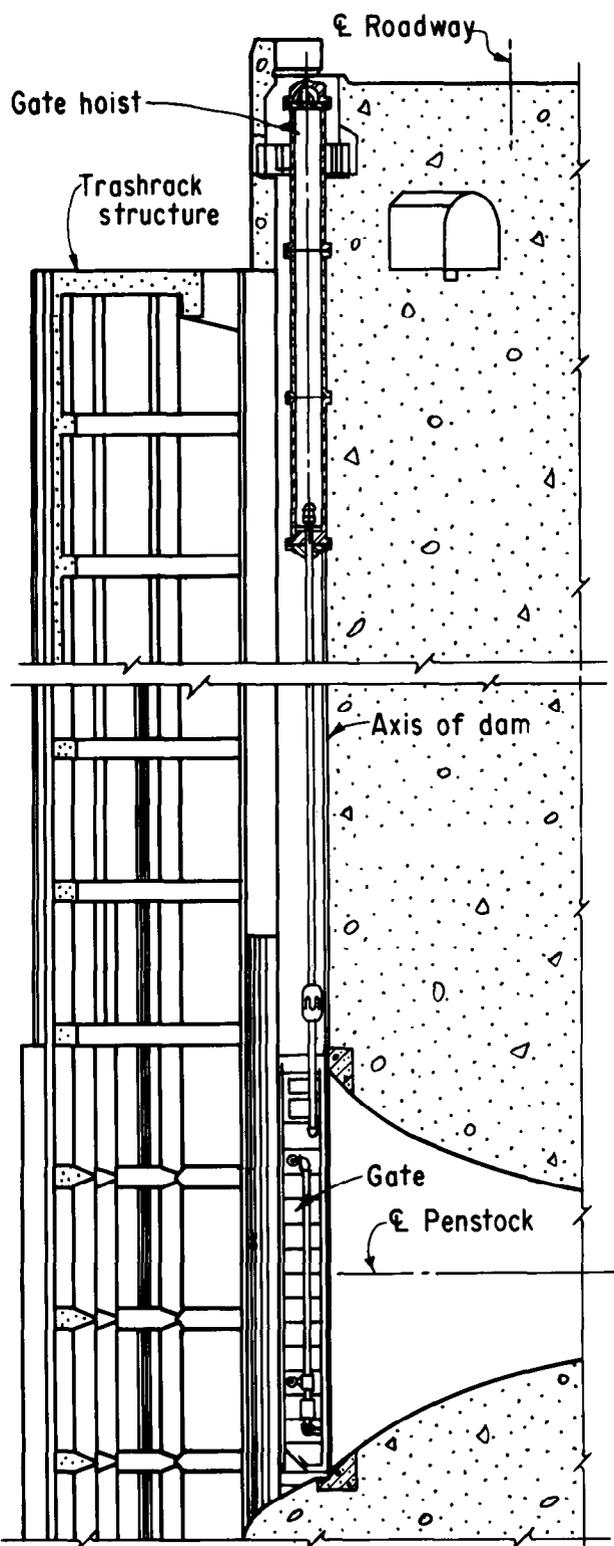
Typical fixed-wheel gate installation at upstream face of dam. —288-D-3075
